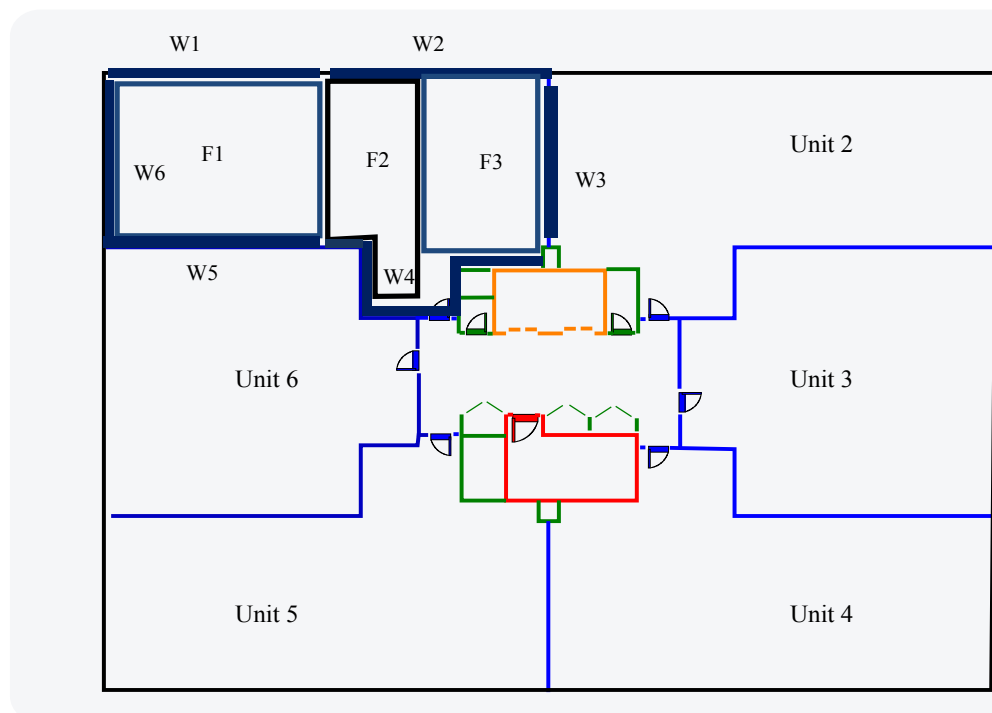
Schematic showing simple structural layout for an apartment in a timber building.
